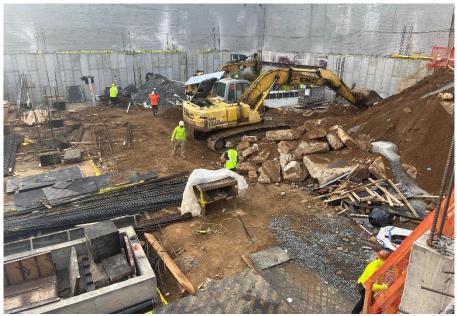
View of contractor prepping SOE in southern portion of Site, facing southeast.
